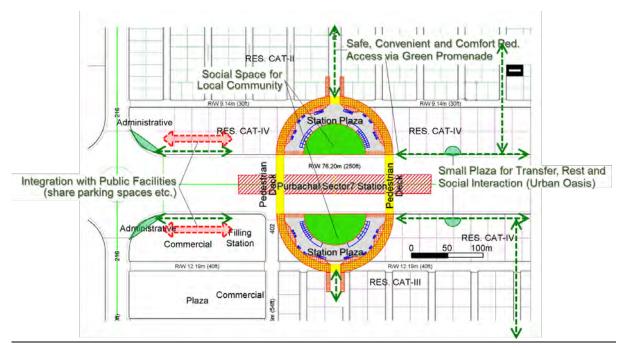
Proposed Station Plaza at Purbachal East Station (Alternative 1)
